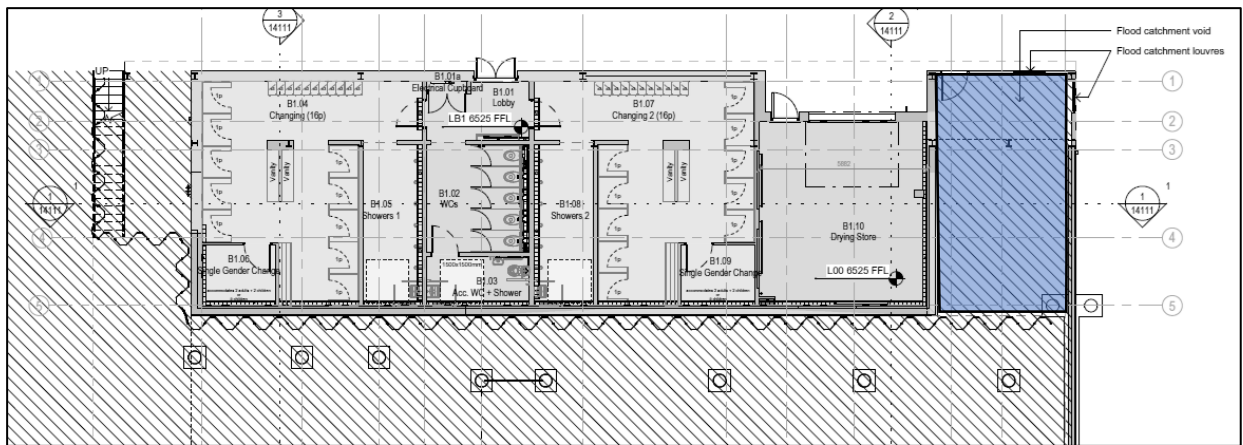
Basement level floor plan for main building showing the area of the unused void space designated to flood.
